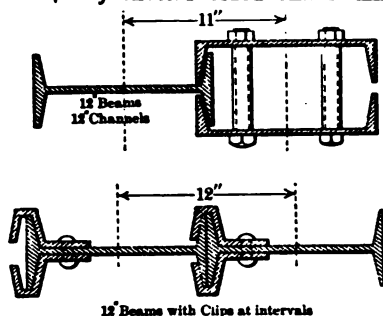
JACKSON'S STEEL SHEET-PILING WITH CLIPS.
